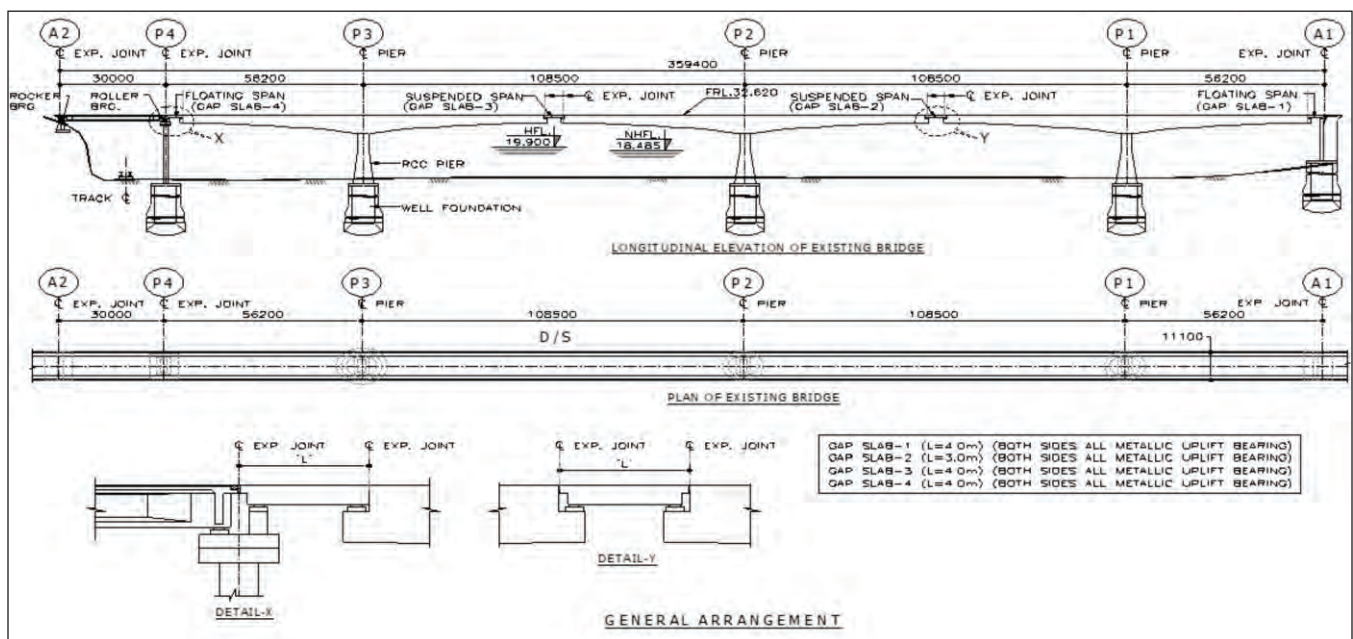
Structural Scheme of the Bridge : (30m + 56.2m + 108.5m x 2 + 56.2m)
